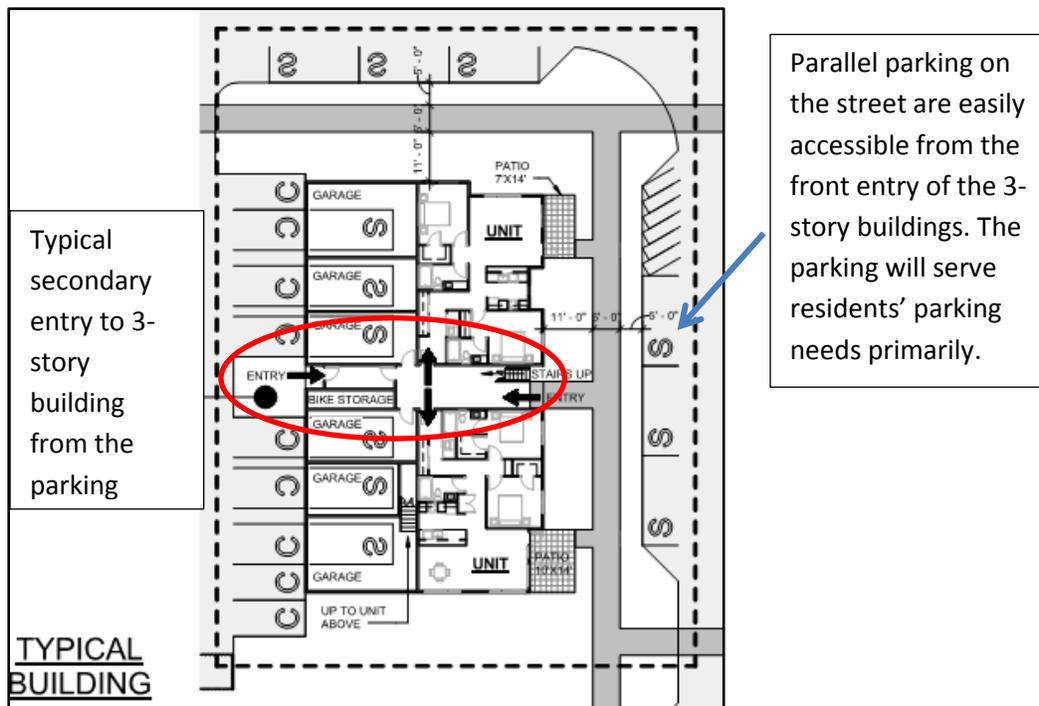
The parking spaces for the 3-story buildings are accessible from the main entry and a secondary entry from the parking area behind the buildings.
